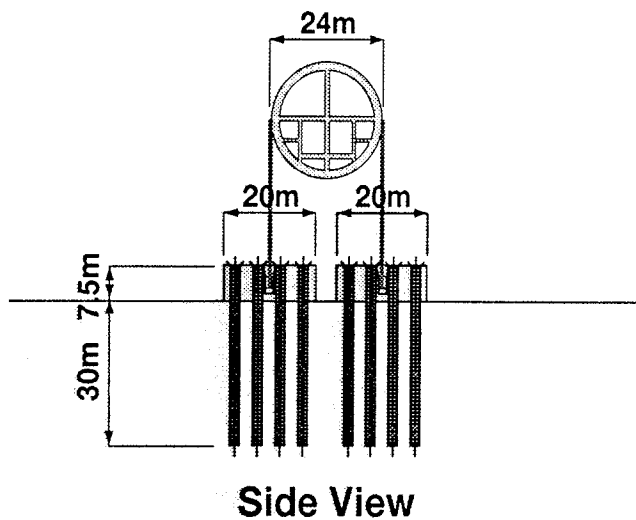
Foundation of S.F.T. (Pile foundation type)
